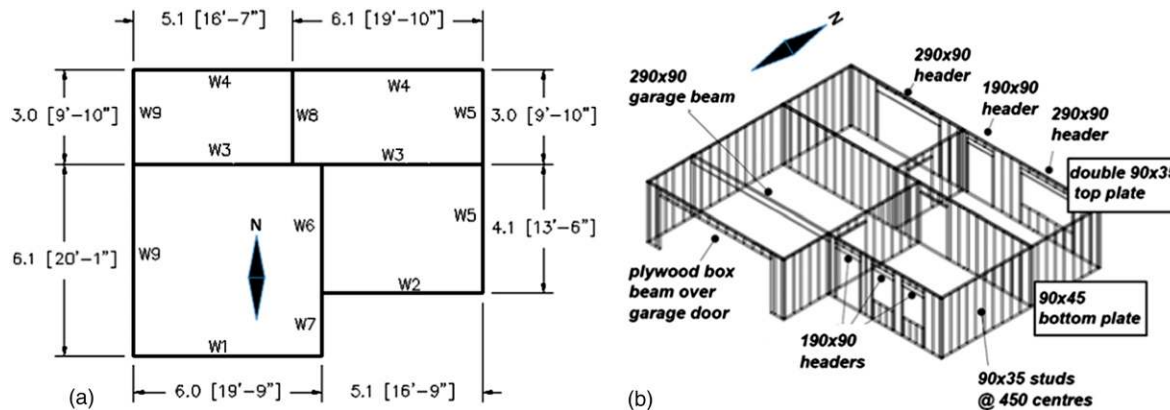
(a) Floor plan with centerline dimensions [m (ft-in.)] and wall designation; (b) wall framing (mm)
